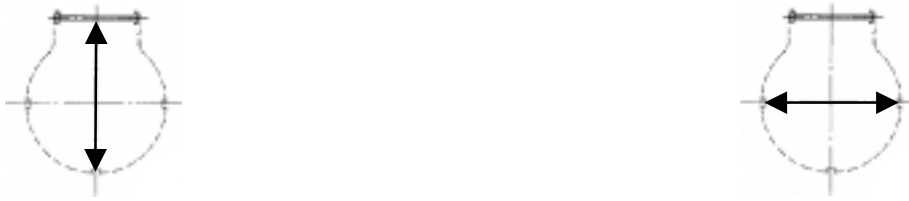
Rung to hoop dimension (left hand view) and hoop width dimension (right hand view)
